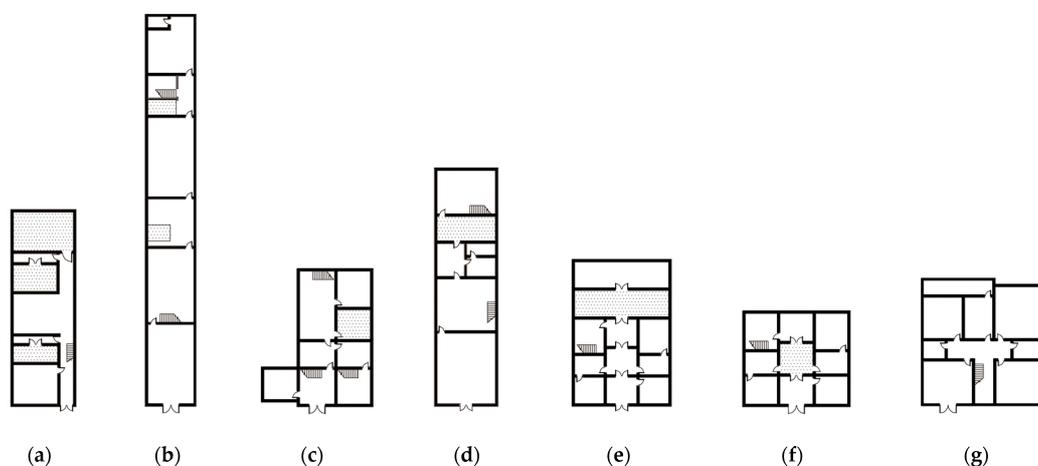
Typical ground floor plans of residences in different periods surveyed in Luzhangwan village. (a) is the ground floor plan of a house built before 1949; (b) is the ground floor plan of a house built in the 1970s; (c,d) are the ground floor plans of two houses built in the 1980s; (e,f) are the ground floor plans of two houses built in the 2000s; (g) is the ground floor plan of a house built in 2013.
